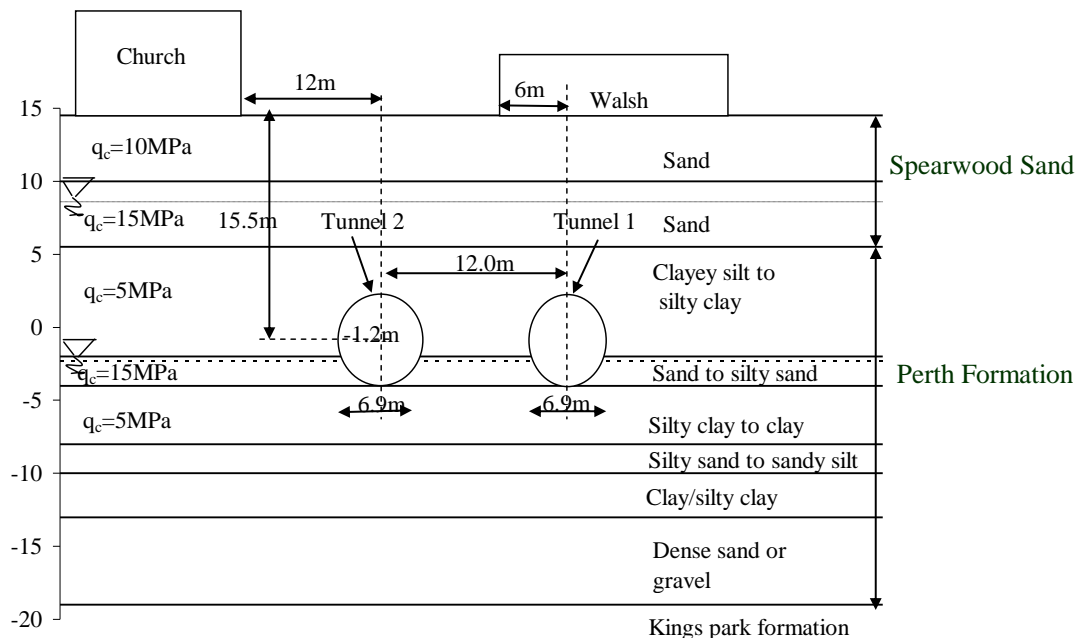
Soil Profile and Location of Tunnels near WALSH Building (Grouted area)
